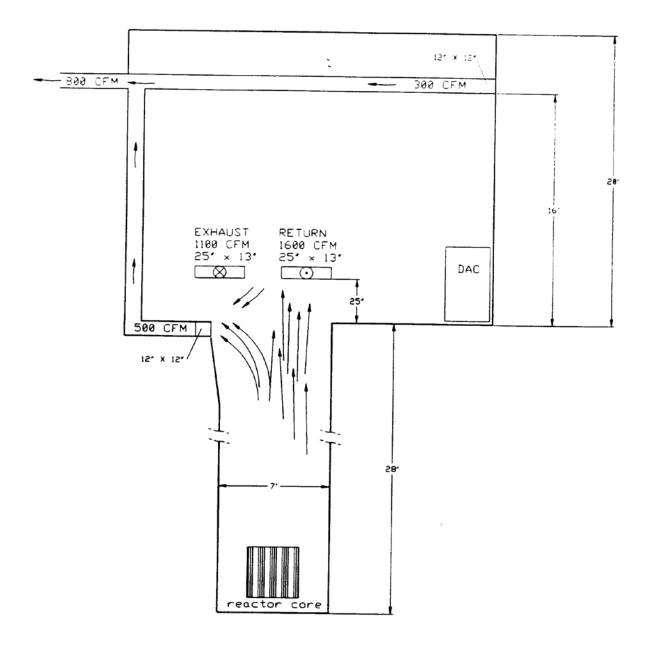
ELEVATION VIEW SHOWING REACTOR TANK, REACTOR HALL, INLET AND OUTLET VENTILATION DUCTS
